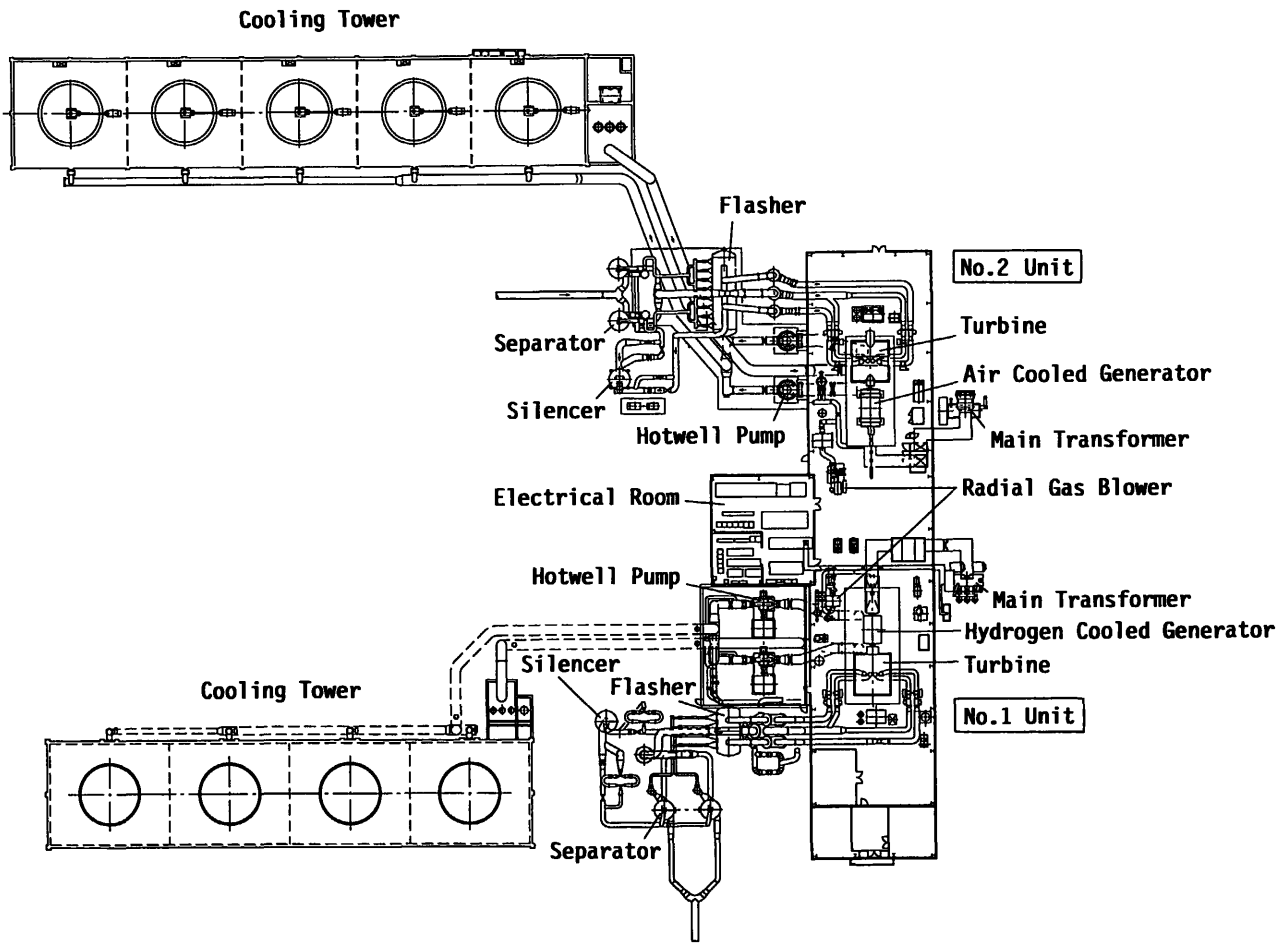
Plant layout of Hatchobaru No.1 and No.2 units
